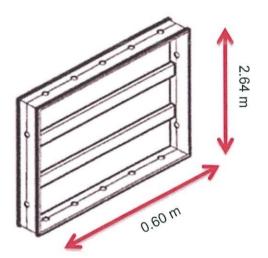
Wall Panel Source: architectjaved.com (n.d)
